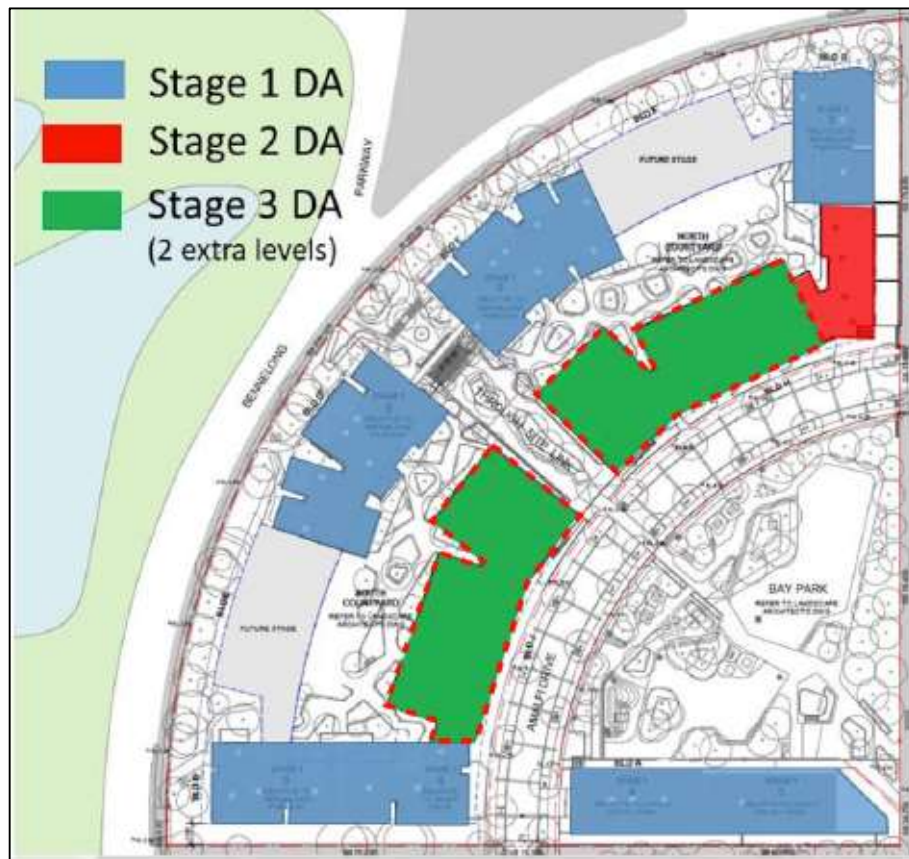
| Development approvals at the site (Source: RtS April 2020)
